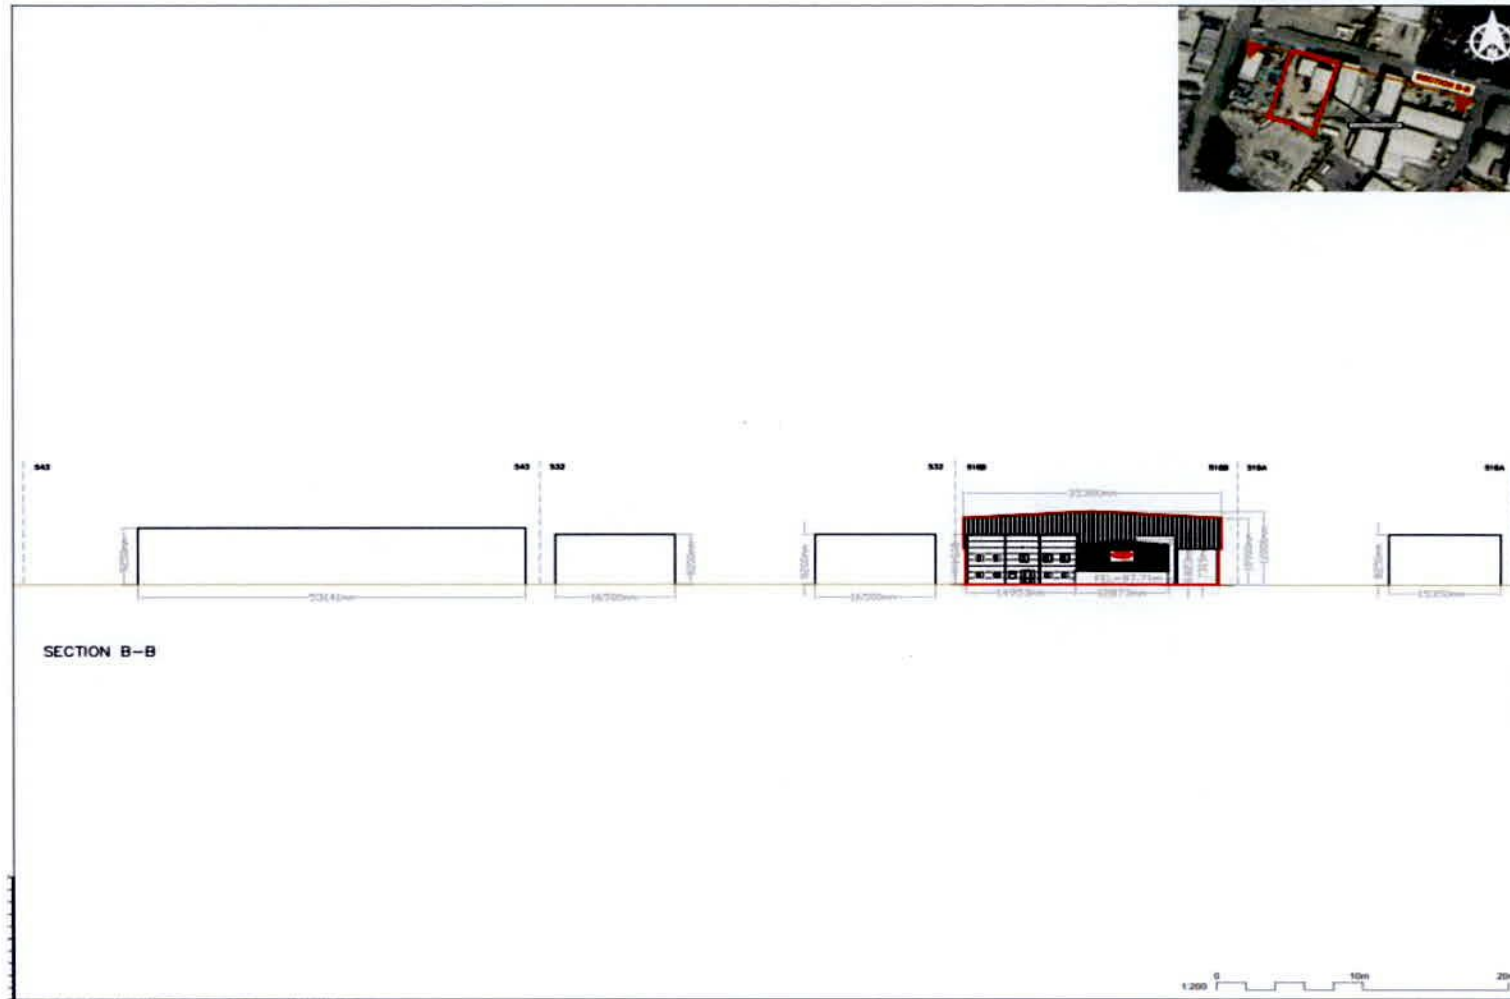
Contiguous Elevation of the Proposed Development with Adjoining Sites (Grants Crescent) (not to scale)
